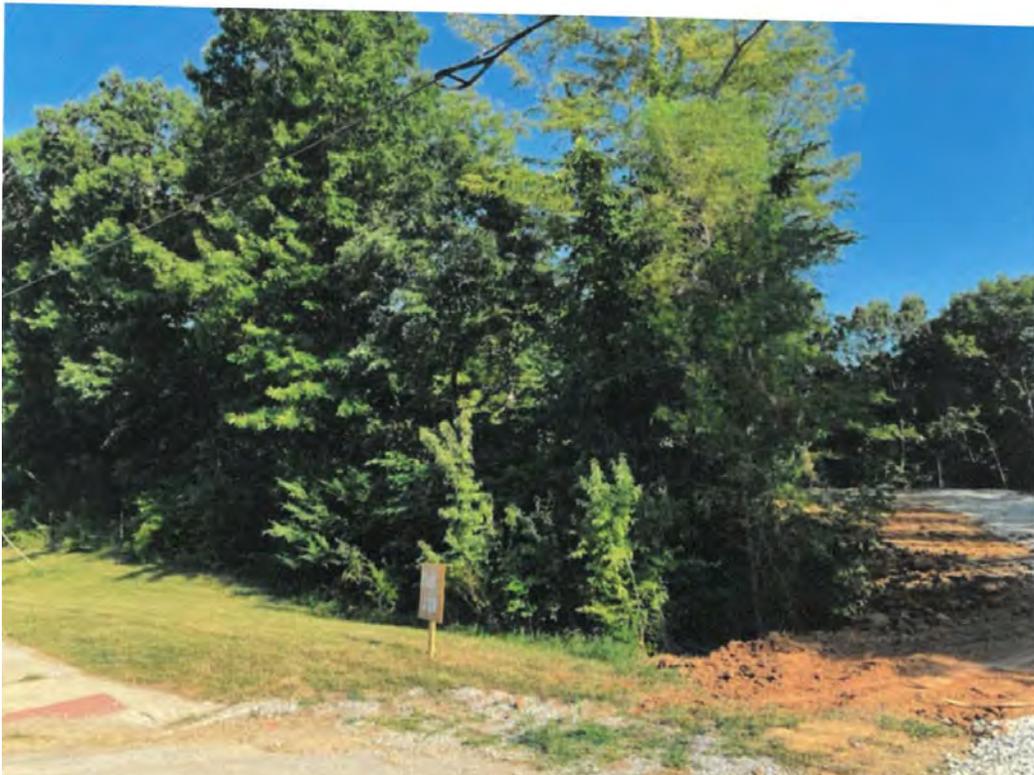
HOLLINGSWORTH ROAD PROVIDED BY THE APPLICANT, CONT.
